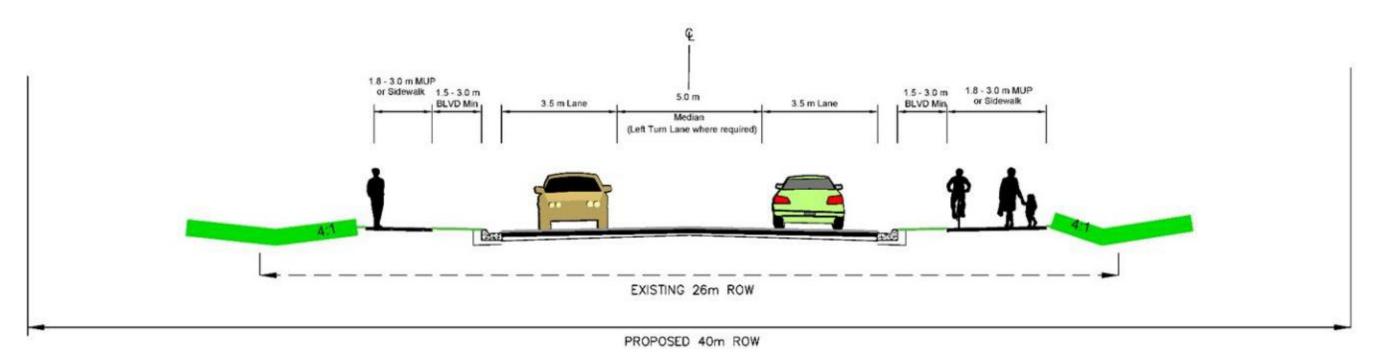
Section 1 Alternative 2 – 3-Lane Urban Cross Section
